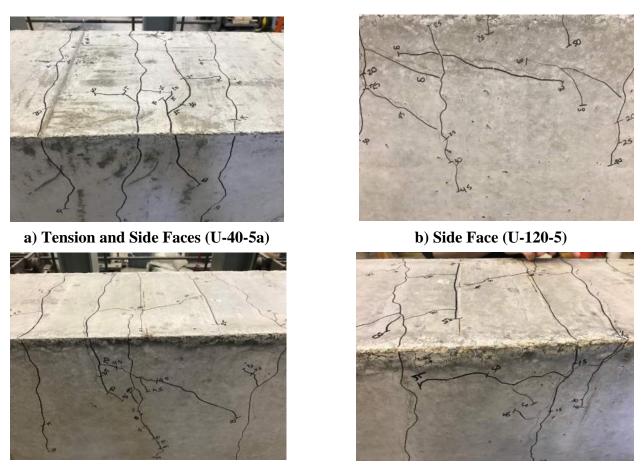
Spacing of Cracks in 100-psi Specimen
